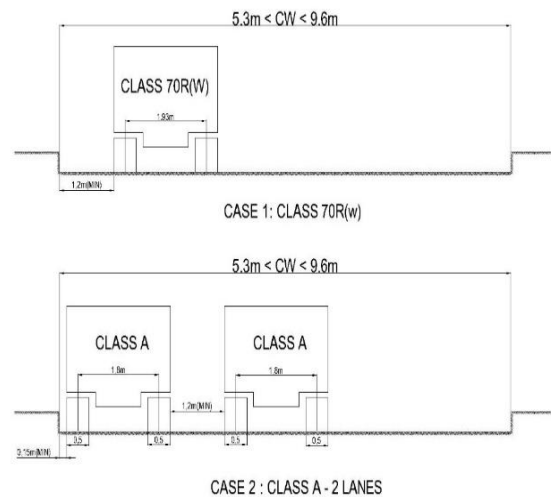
Carriageway Width and Loading Arrangement for Two-Lane Bridge
